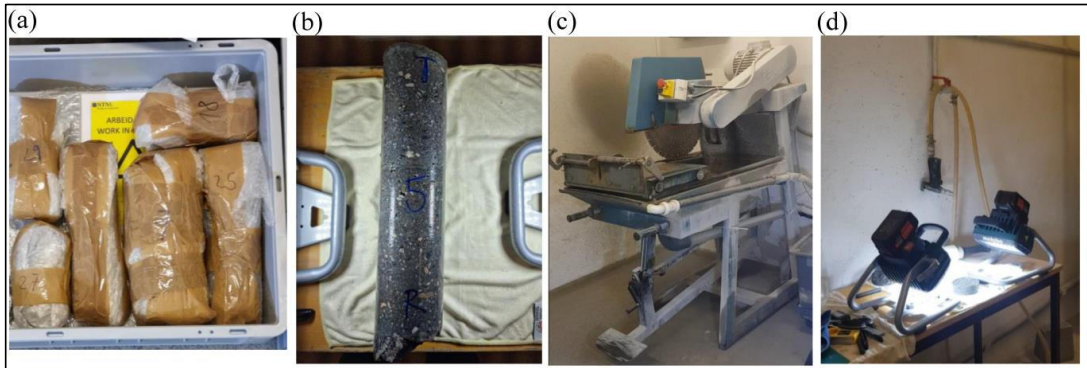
Shotcrete images before and after being sliced in the concrete saw. (a) shotcrete cores received in the laboratory, (b) shotcrete core photographed, (c) concrete saw, and (d) shotcrete sample marked and photographed.
